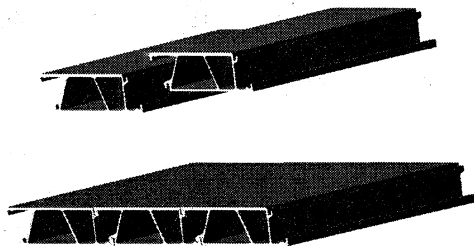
Concept of vertical snap-fit connection for the composite bridge decks
